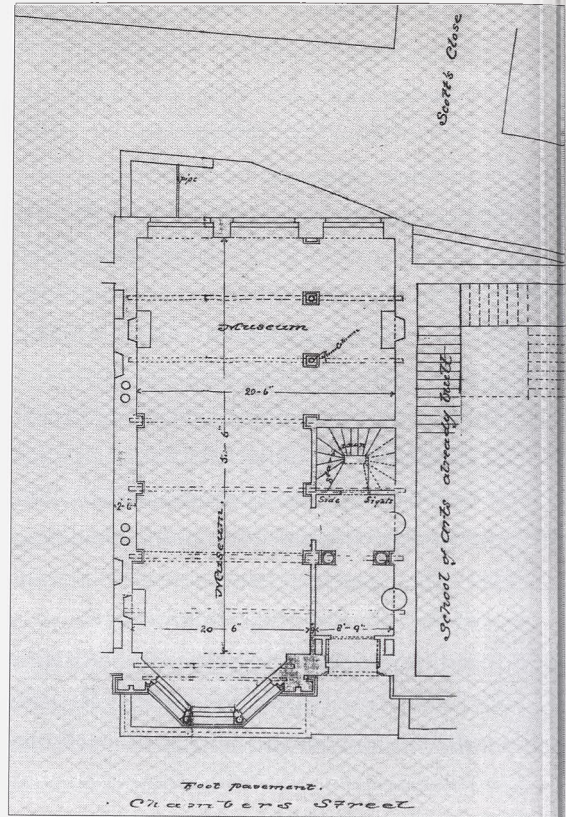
David Cousin's ground floor plan of the Phrenological Museum in Chambers Street. (Edinburgh City Archives, DGCA.)
